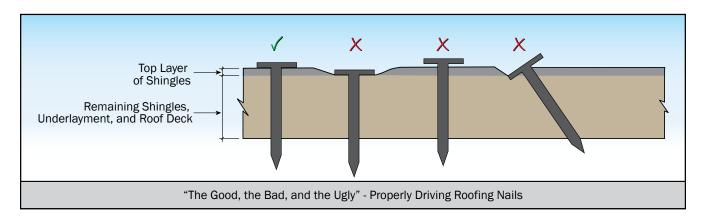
The Dos and Don'ts of driving roof nails through asphalt shingles.
